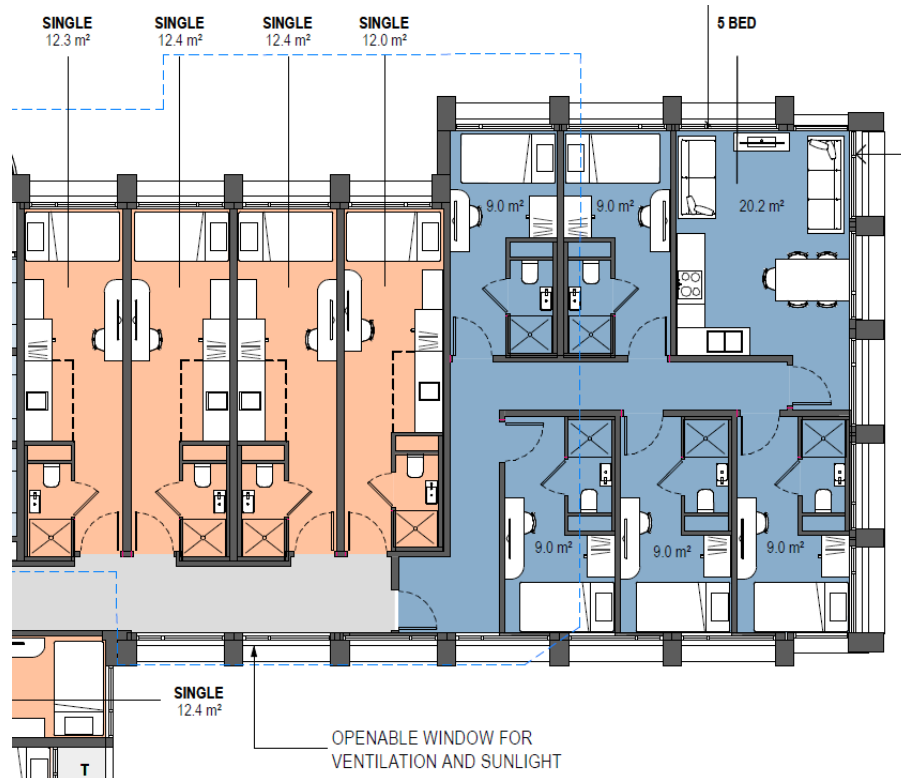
Extract from the proposed Level 1 to 5 Floor Plan demonstrating the floorplan layout of multi-bed room located at the north-eastern corner of the building. The multi-bed room is capable of accommodating 5 lodgers. Each bedroom has an ensuite. A shared living room and kitchen is provided (top right).
